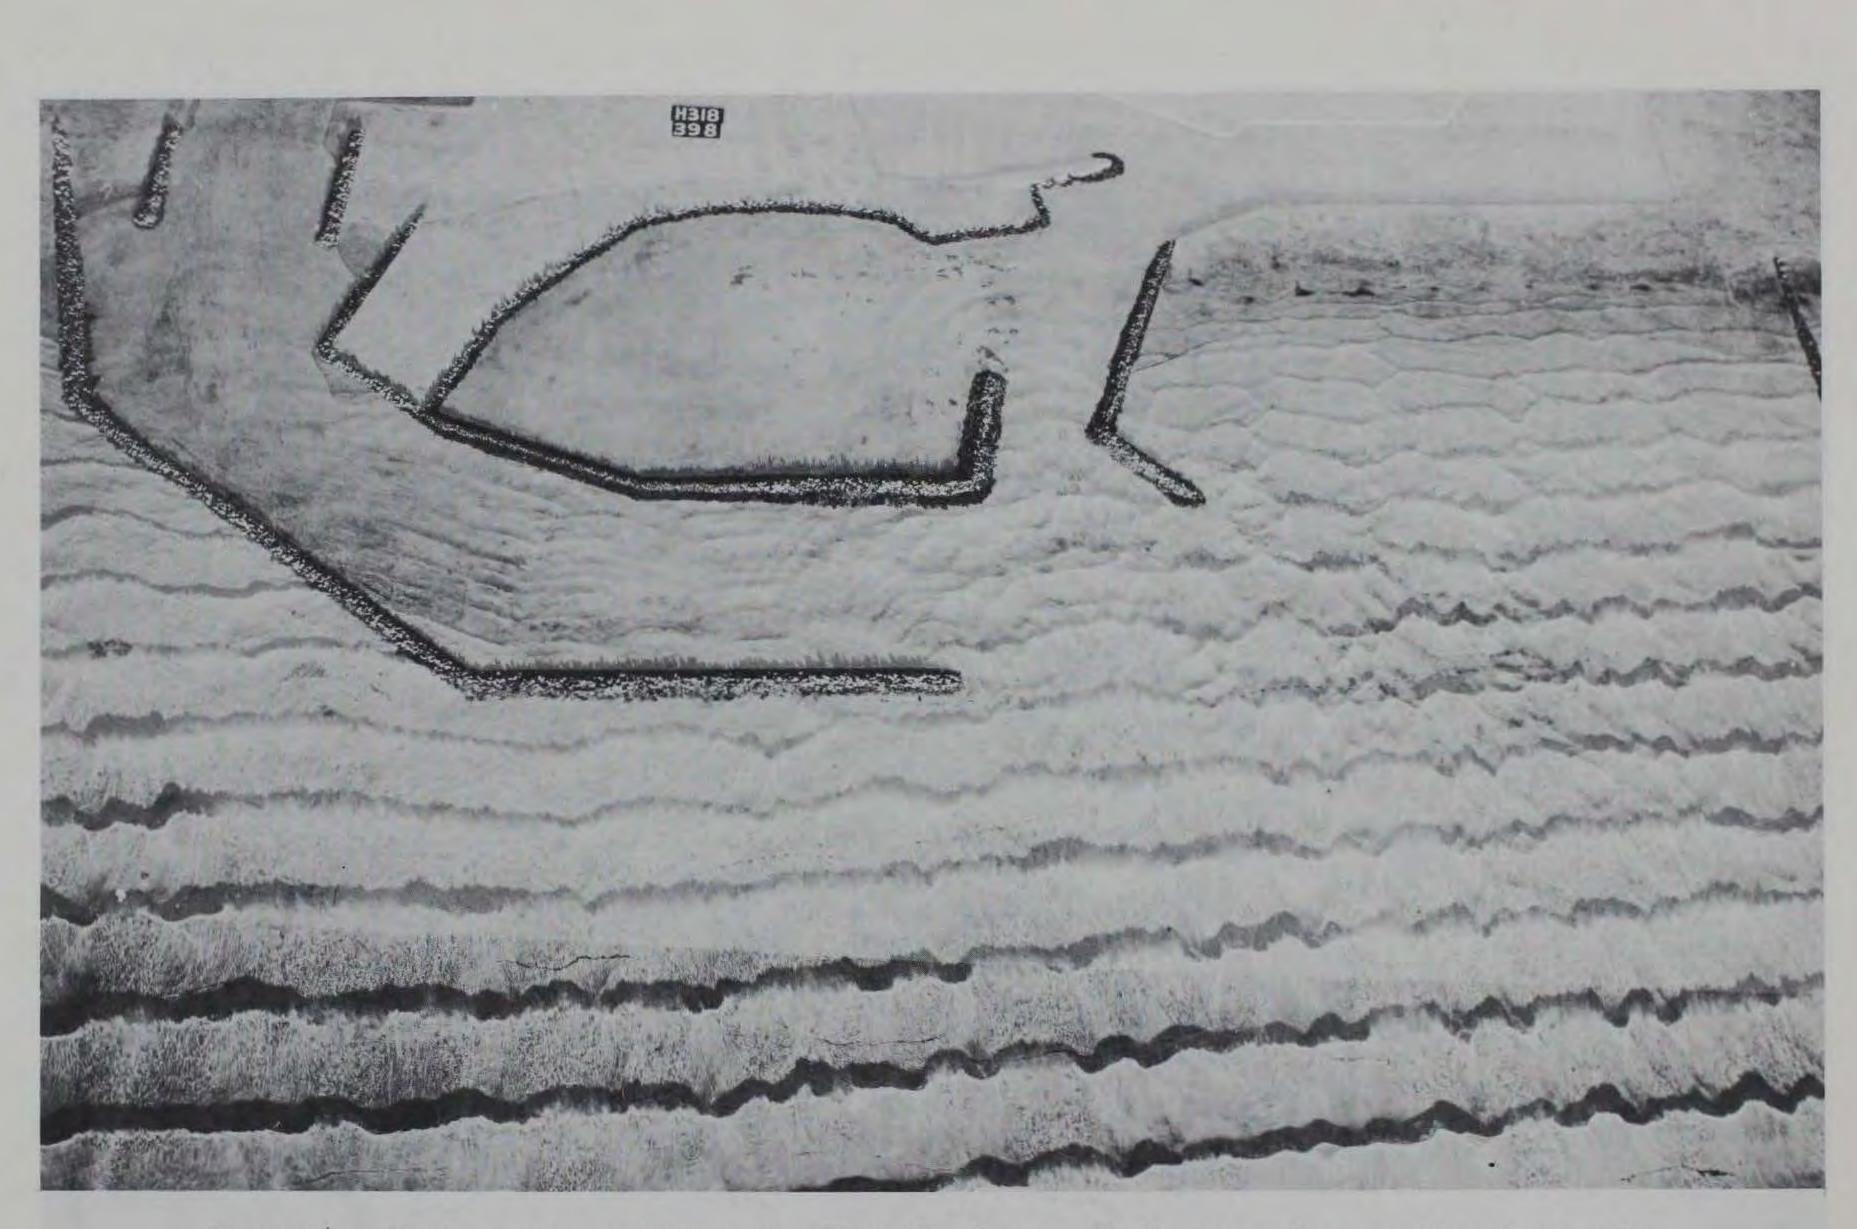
Typical wave patterns for Plan 25; 9-sec, 10-ft waves from southwest at mhhw
